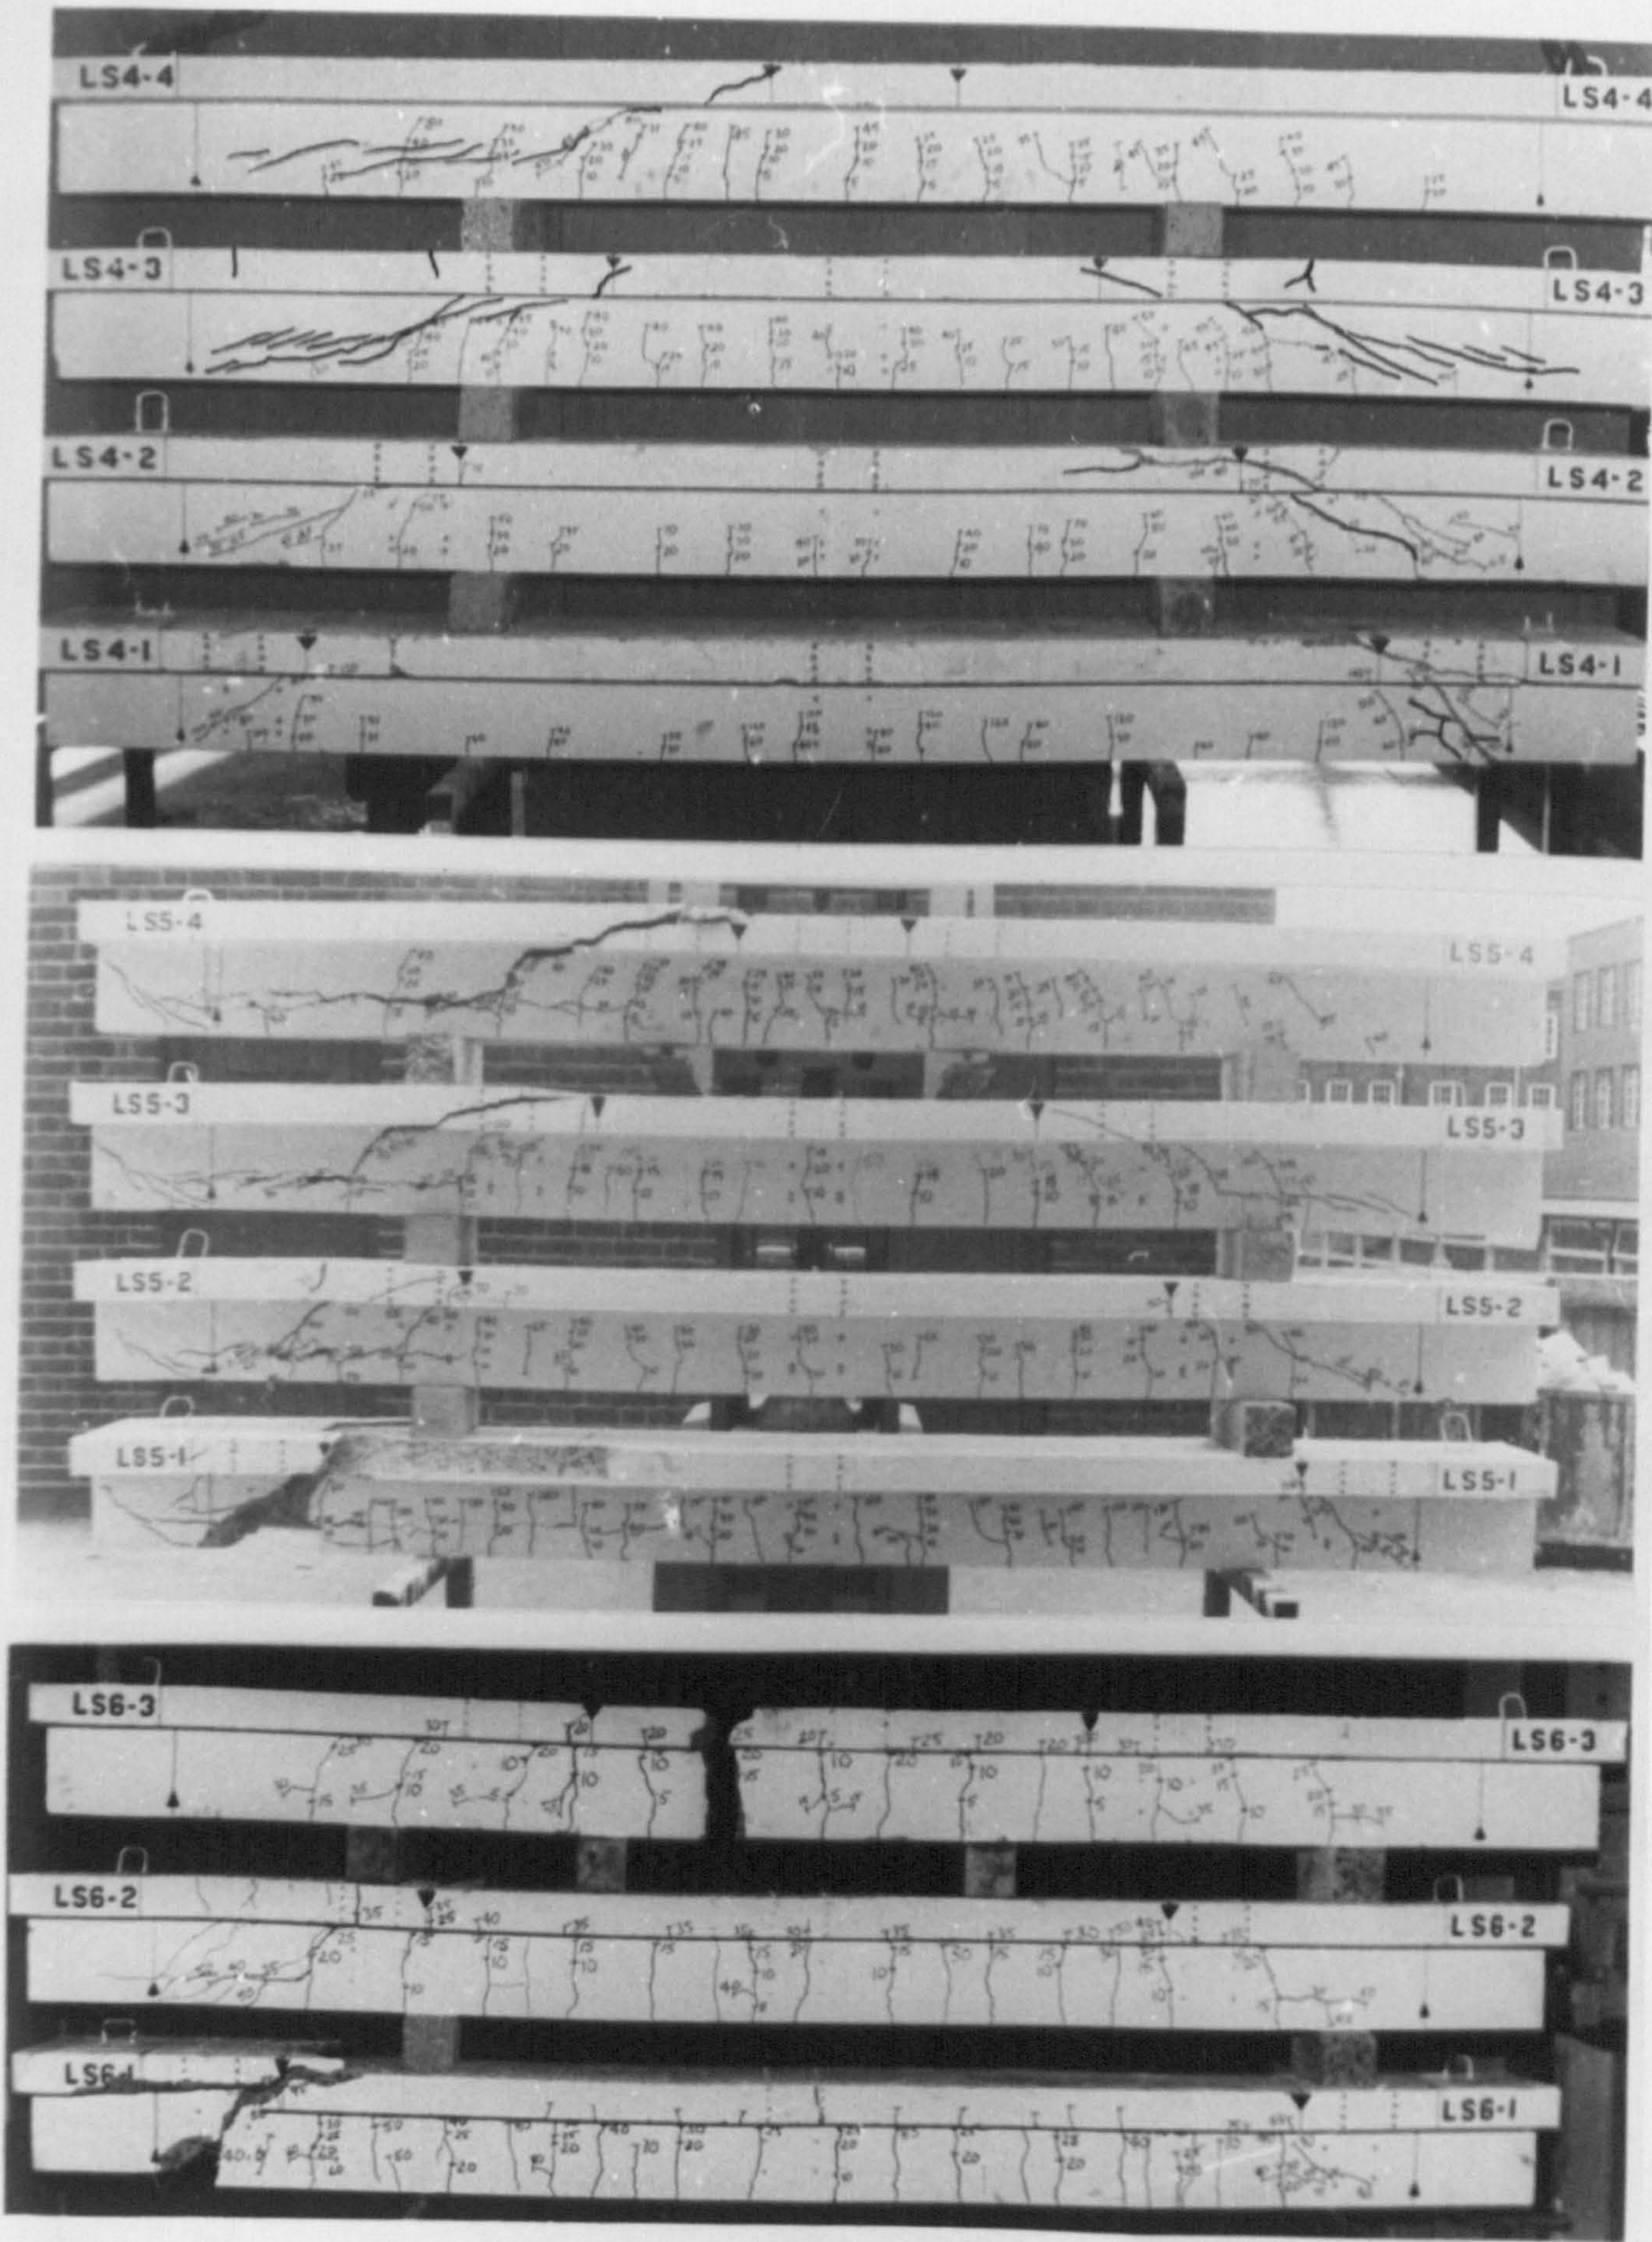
(b) FAILURE MODES FOR LYTAG-SAND CONCRETE T-BEAMS IN SHEAR
